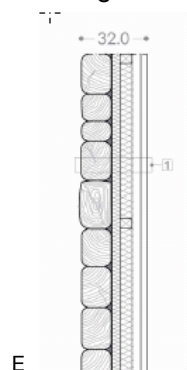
AlpHouse pilot-building Welf in Gressoney-La-Trinité, sectional detail of Blockbau wall with internal insulation after renovation, by Arch. Luigi Chiavenuto and COA Energia Finaosta for Regione Autonoma Valle d'Aosta
